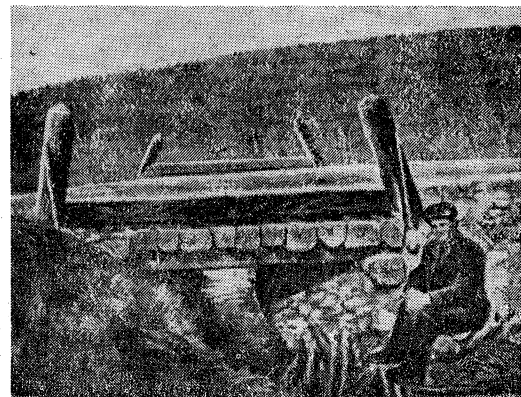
Typical Small Bridge at an Icing Formed by a Spring, Amur-Yakutsk Highway
